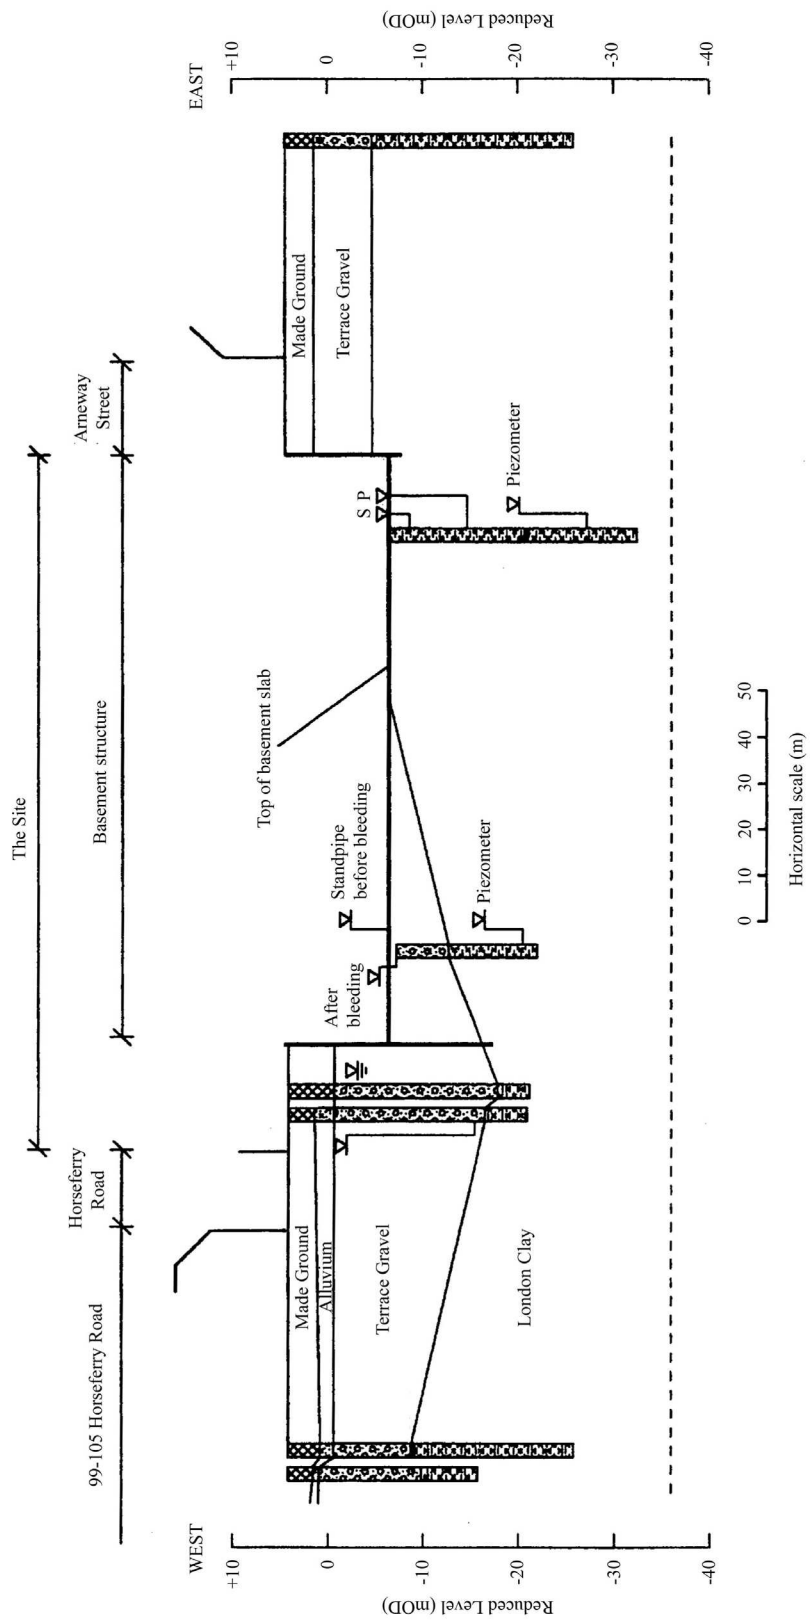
Site section showing relevant borehole information, Chapman (1999)
